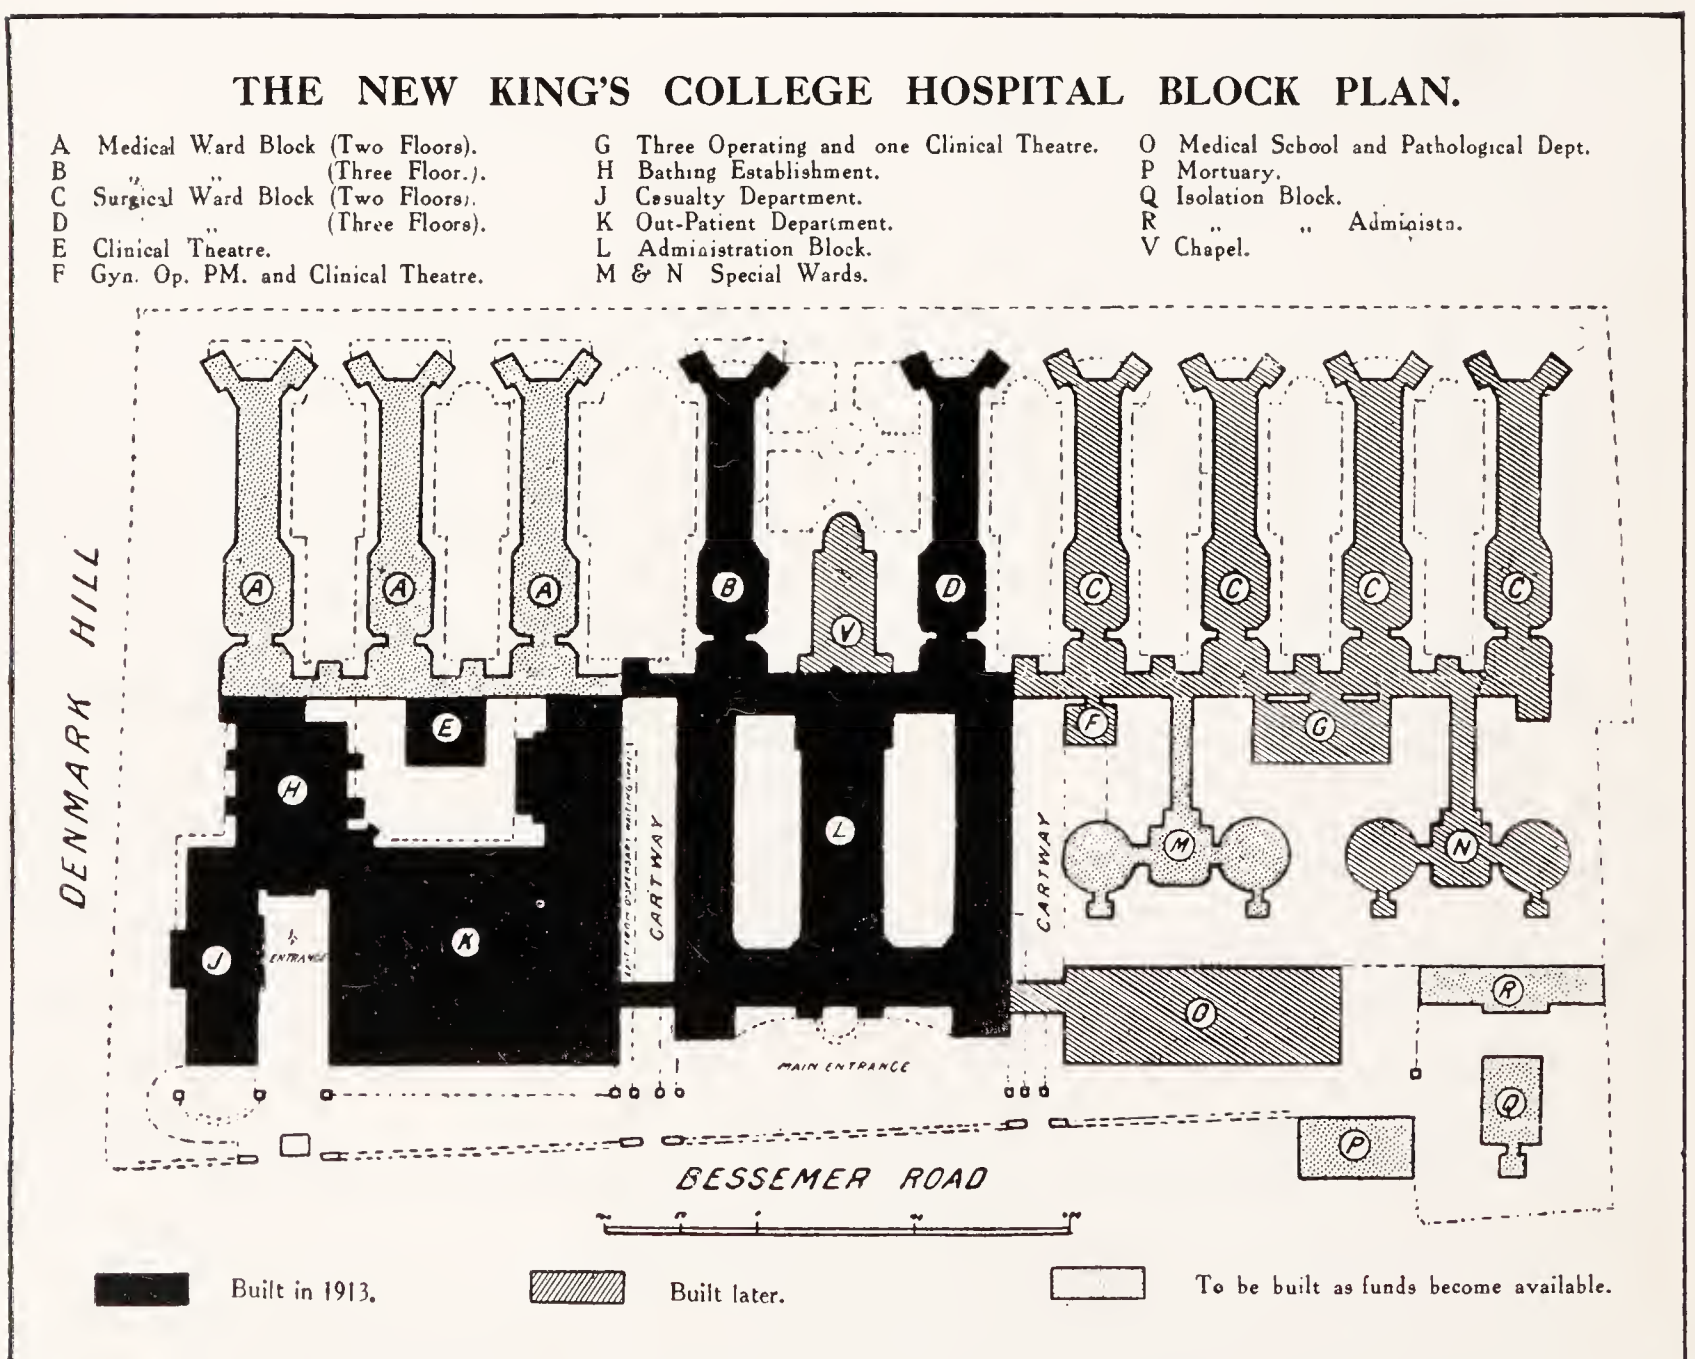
PLOT PLAN, KING'S COLLEGE HOSPITAL, LONDON, ENGLAND
